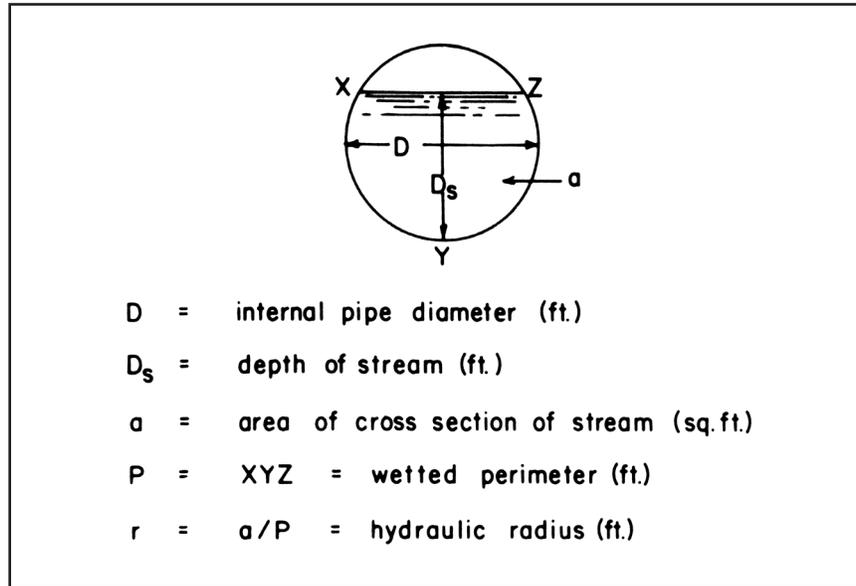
Cross Section of Cast Iron Soil Pipe Open Channel Sewer or Drain
